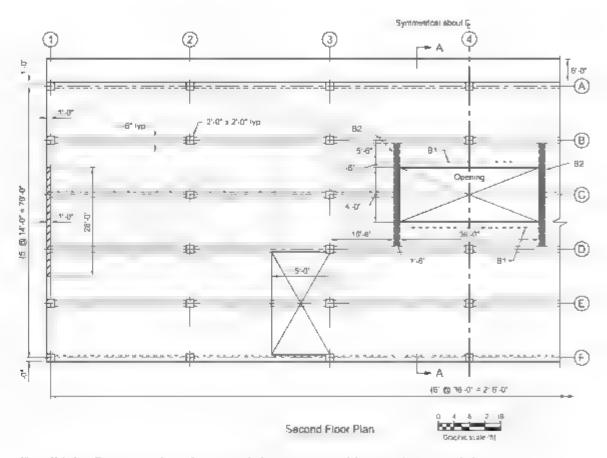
Framing plan showing slab opening and beams framing slab opening.
